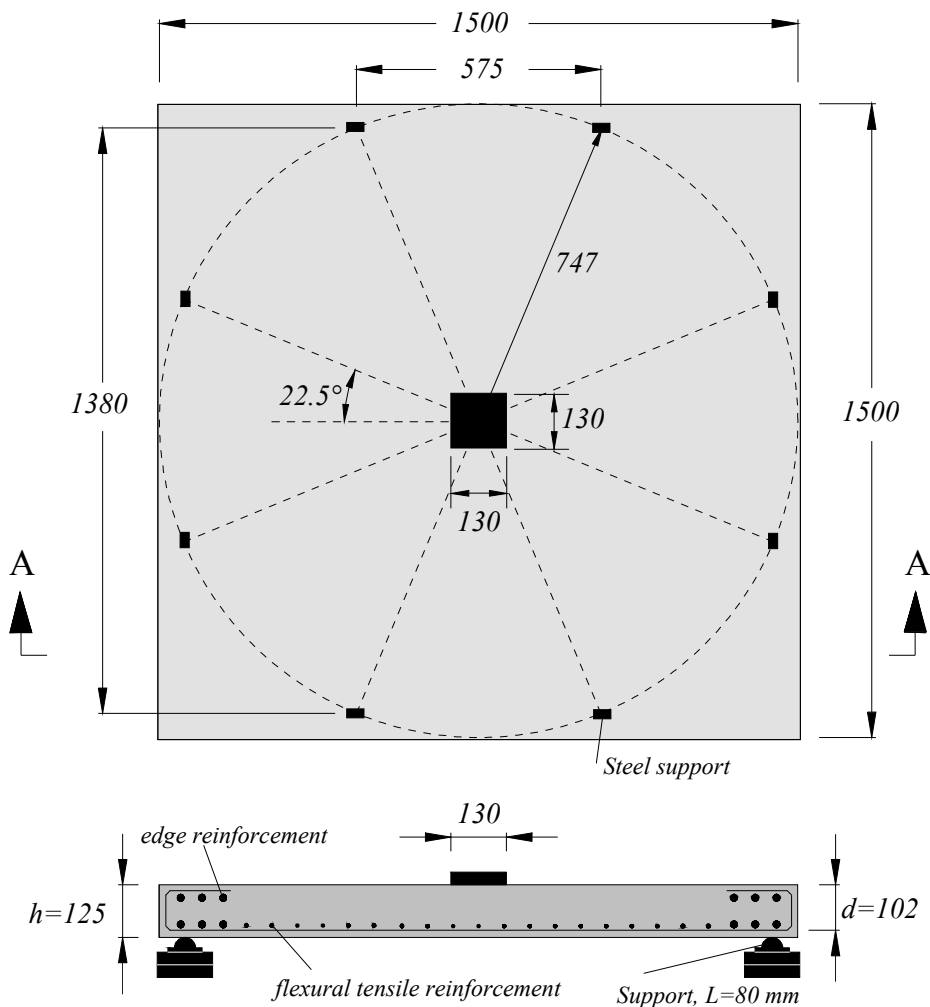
Typical slab dimensions, plan and section [mm]
